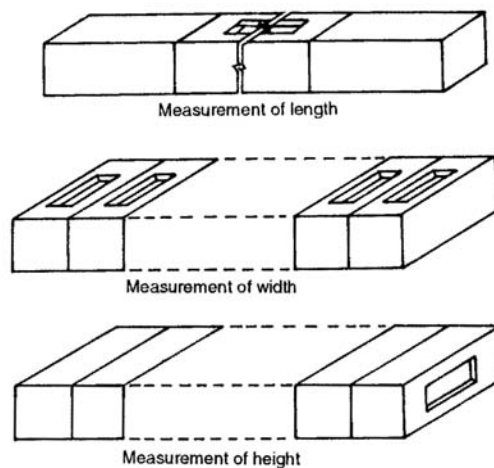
Measurement of Tolerances of Common Building Bricks
